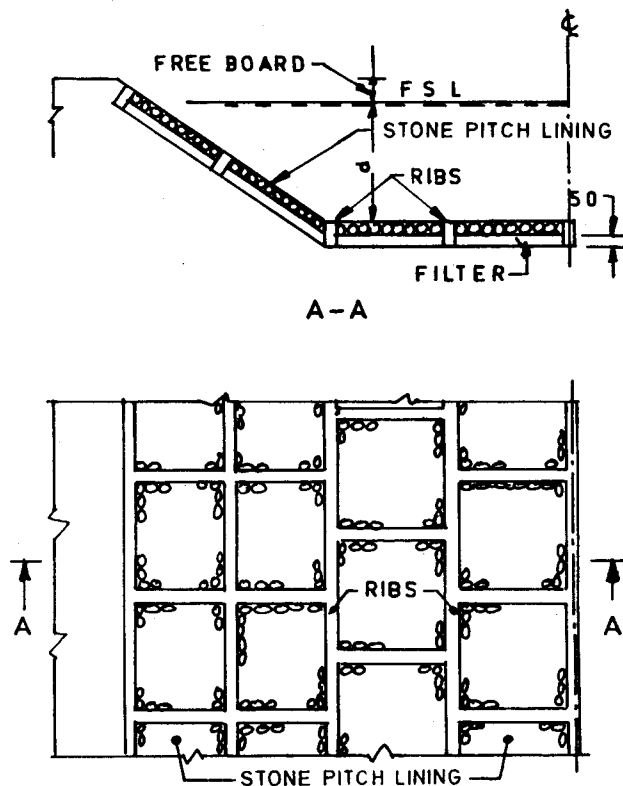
ILLUSTRATORY LAYOUT OF STONE PITCHED LINING FOR CANALS
